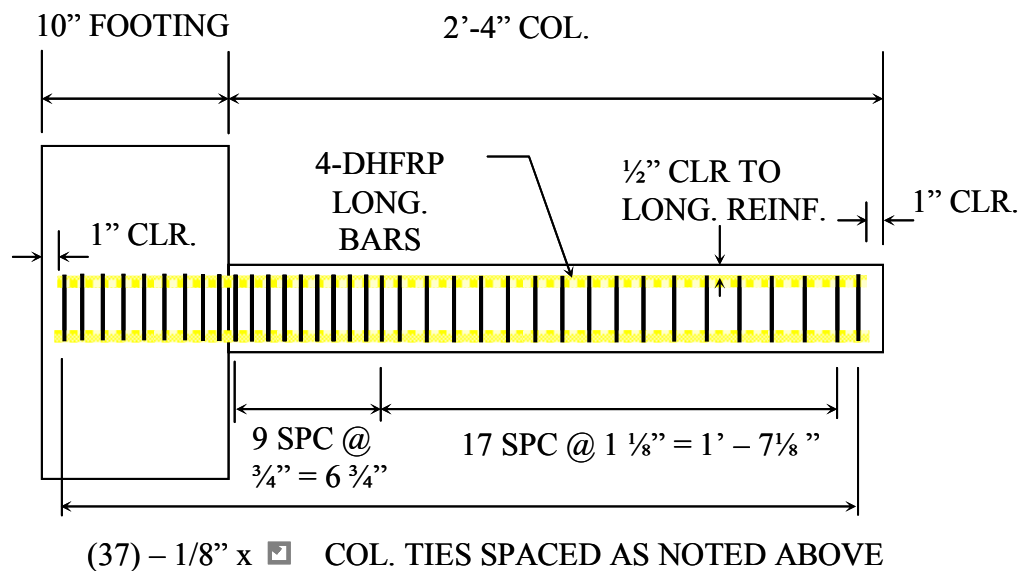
Reinforcing Details for Large-Scale Model DHFRP R/C Columns.
